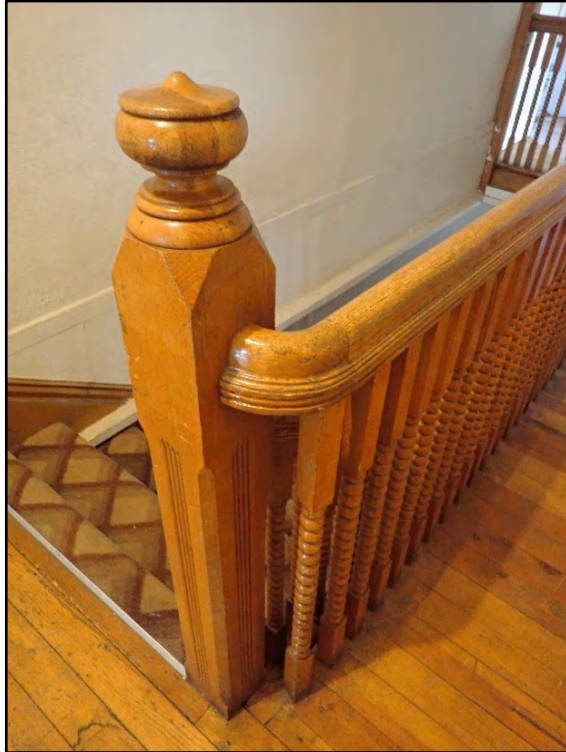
Overview of the main hallway on the second floor (note the main staircase to the first floor).
